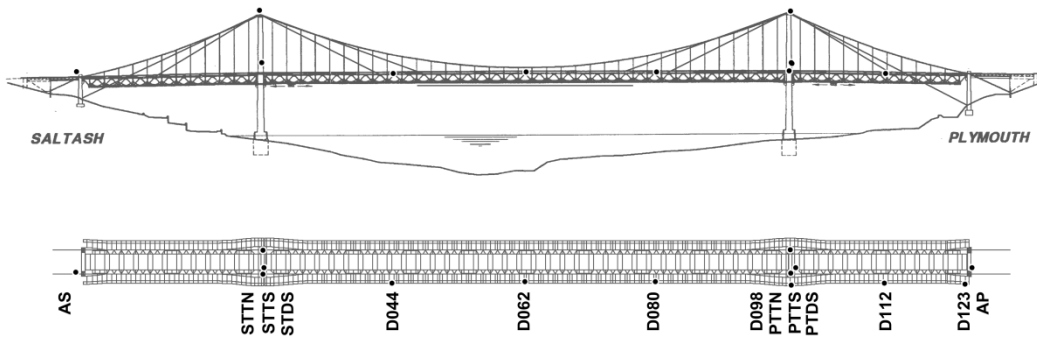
Reflector locations on the suspension bridge; for deck and towers.
